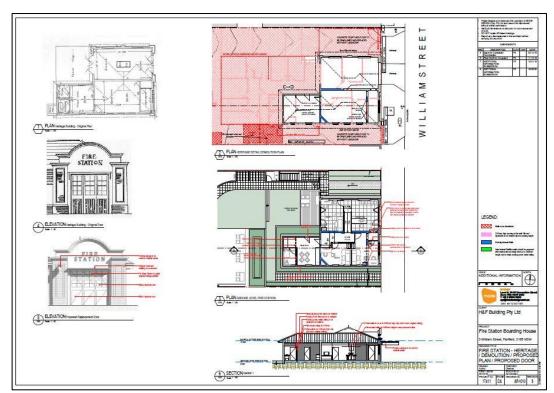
Fire Station- Heritage, demolition, proposed plan and proposed door.
